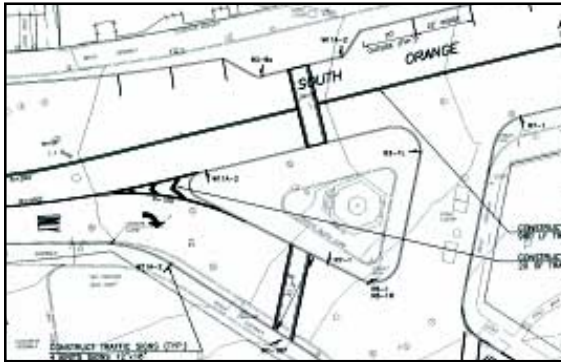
Center island reconstruction at Irvington Avenue/Academey Street.
